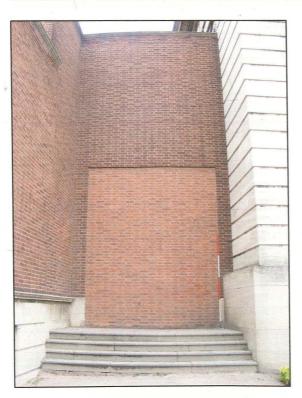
(Shot 9): South elevation of the Curtois Gallery, looking northeast, showing blocked doorway into the corridor between the Usher Gallery and Curtois Gallery
